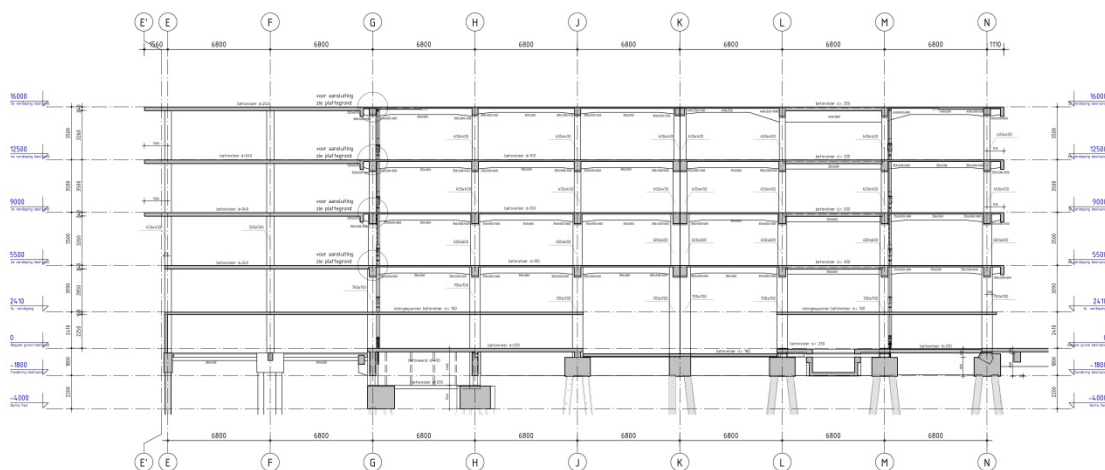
Groot Willemsplein - Section of the existing structure on axis 2
